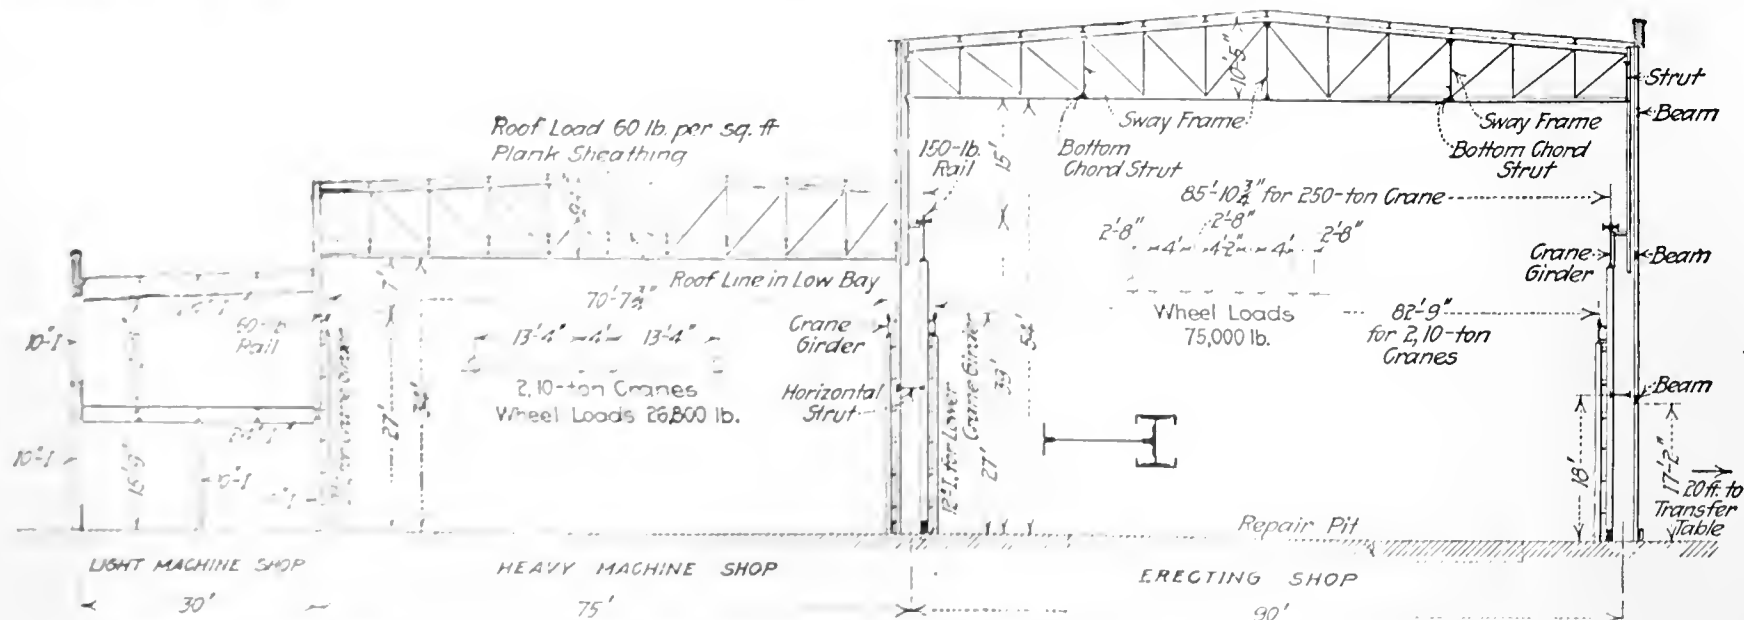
CROSS-SECTION OF LOCOMOTIVE SHOP, SHOWING WHEEL ARRANGEMENT OF 250-TON CRANE
